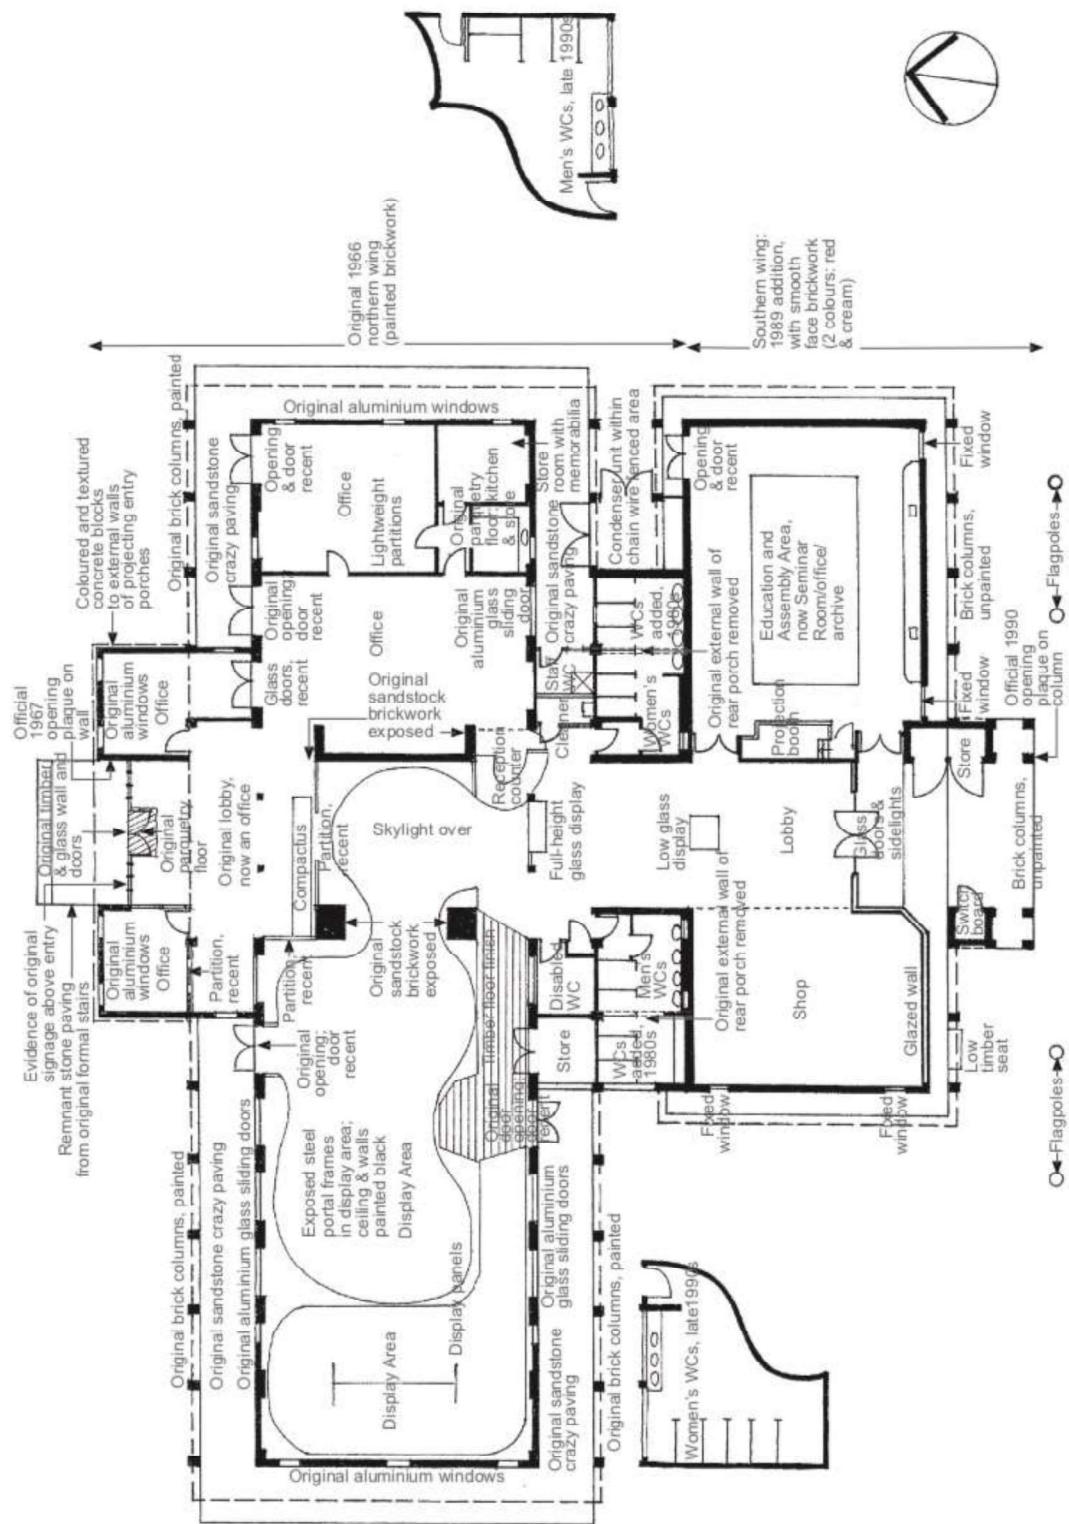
Discovery Centre – plan prior to the 2008 works
